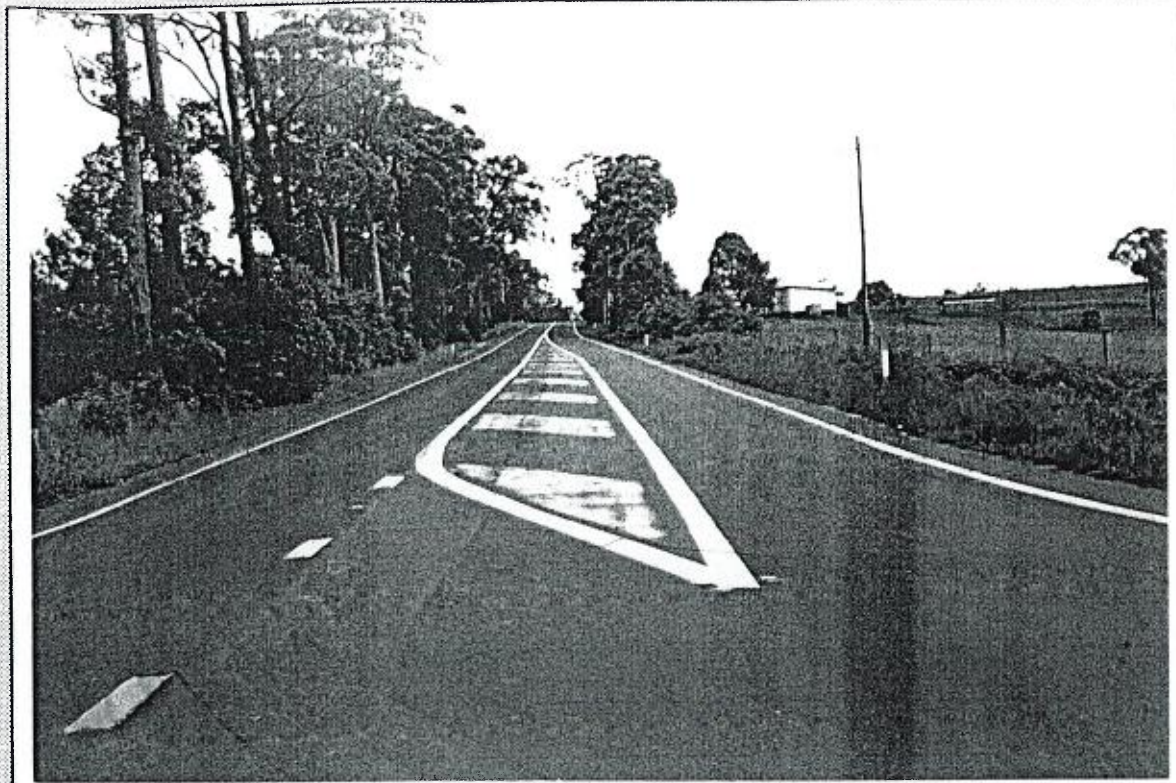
View north along Old Northern Road from Roberts Road.
